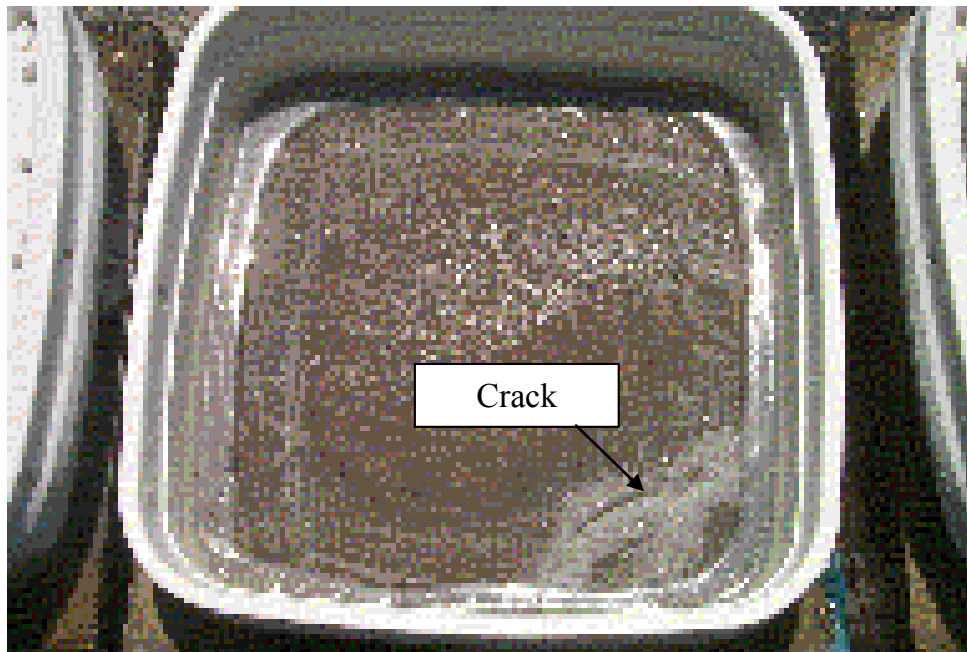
Photo. Example of corner cracking on a 2201 reinforced simulated deck slab specimen.
